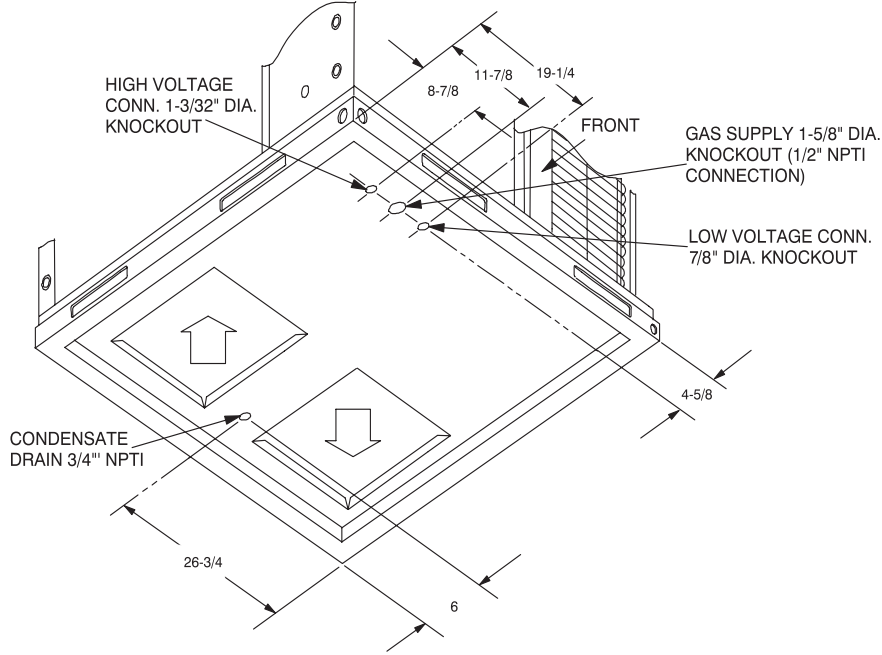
UNIT DIMENSIONS - FRONT & BOTTOM
